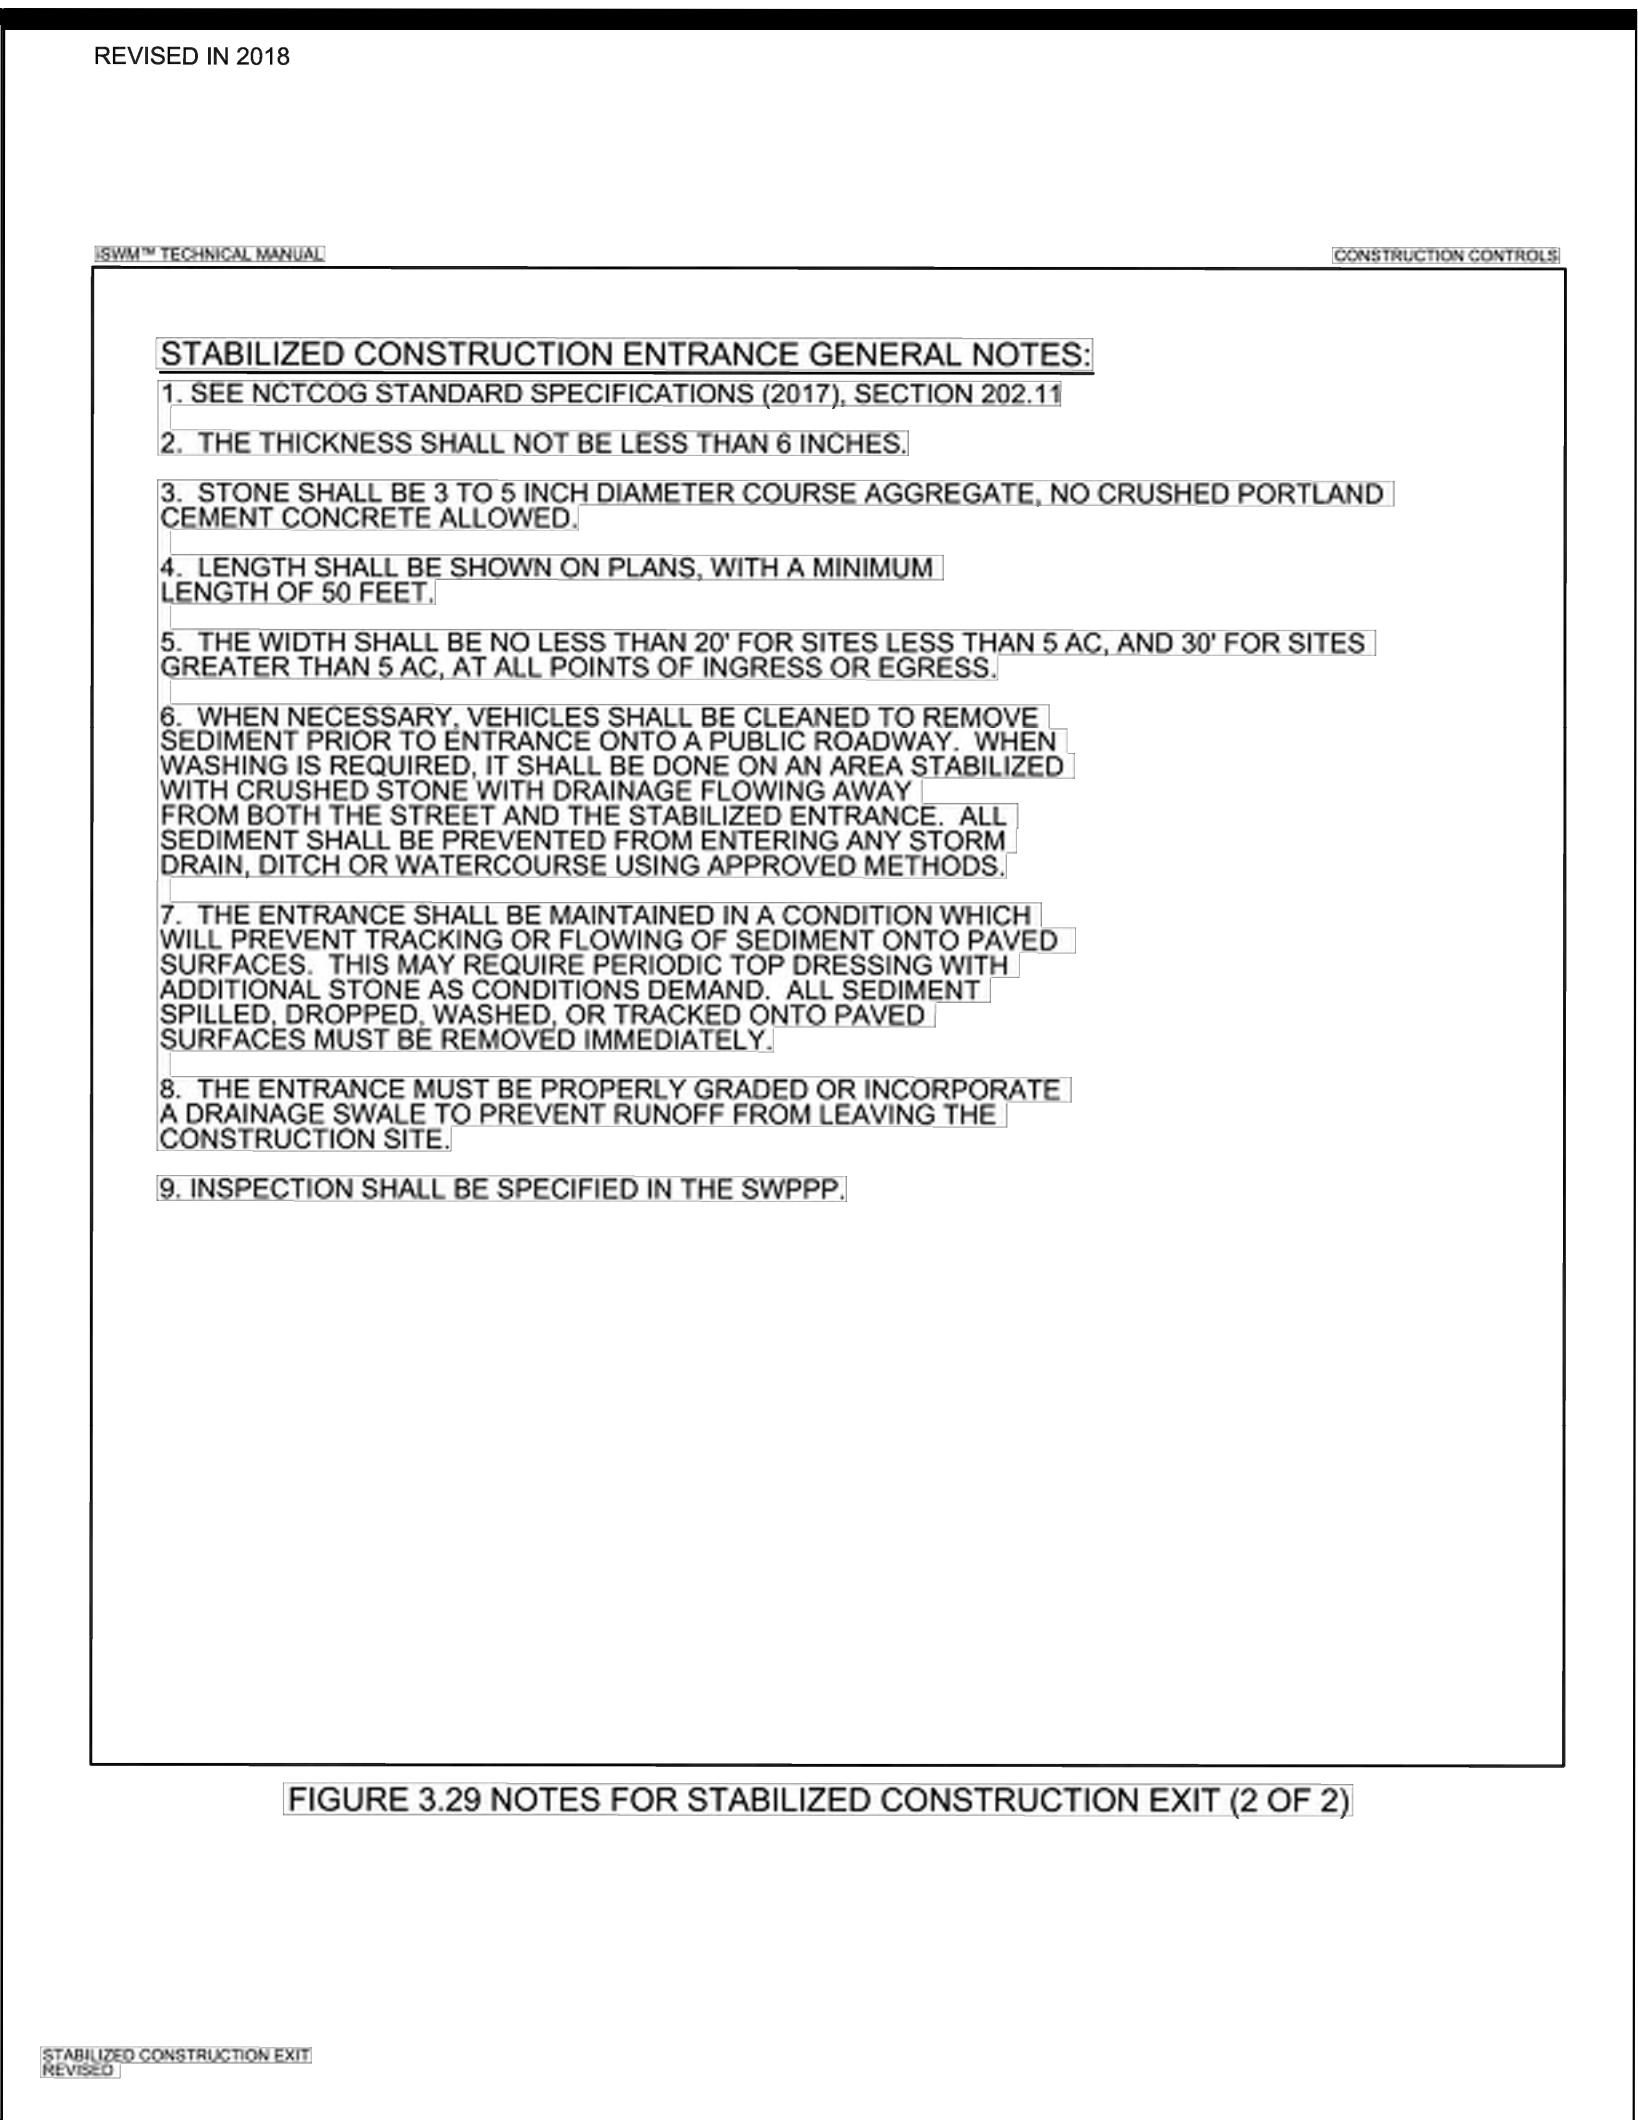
NOTES FOR STABILIZED CONSTRUCTION EXIT (2 OF 2)
